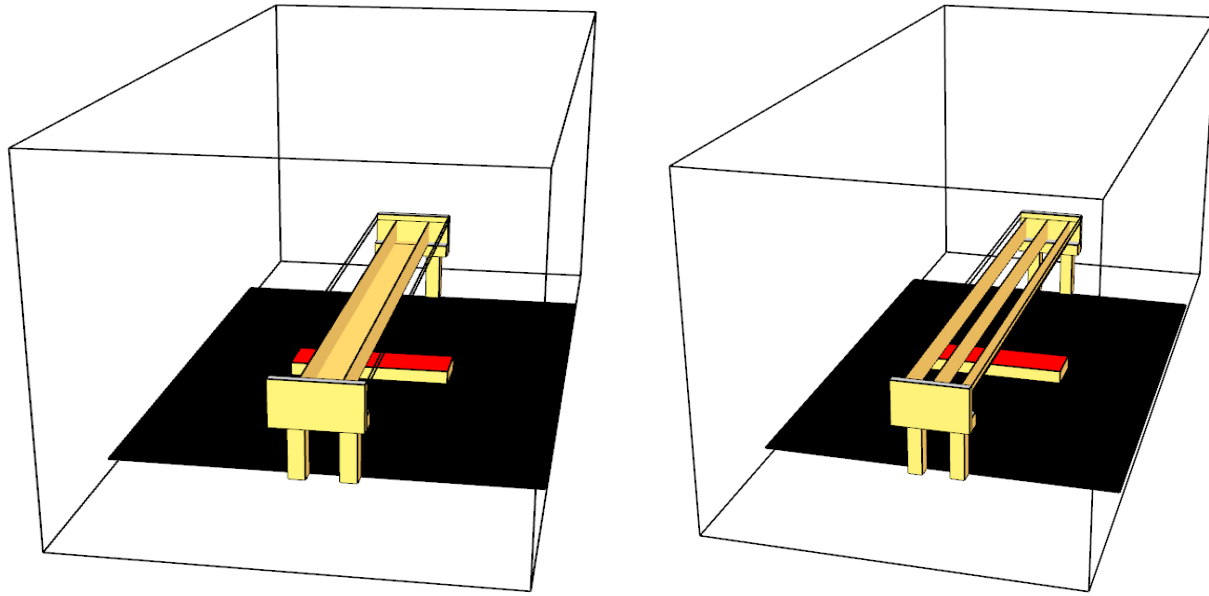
The FDS fire model of the a) plate girder and b) tub girder single lane highway bridge (bridge deck removed to show girder detail).
